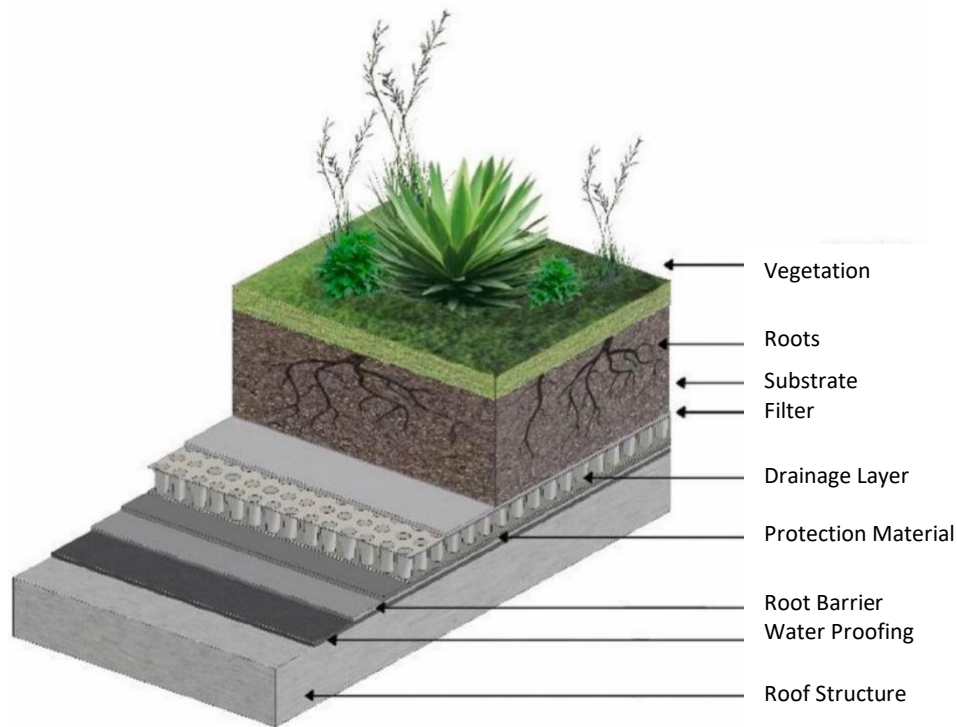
Typical green roof layers (Source: Mihalakakou et al 2023).
